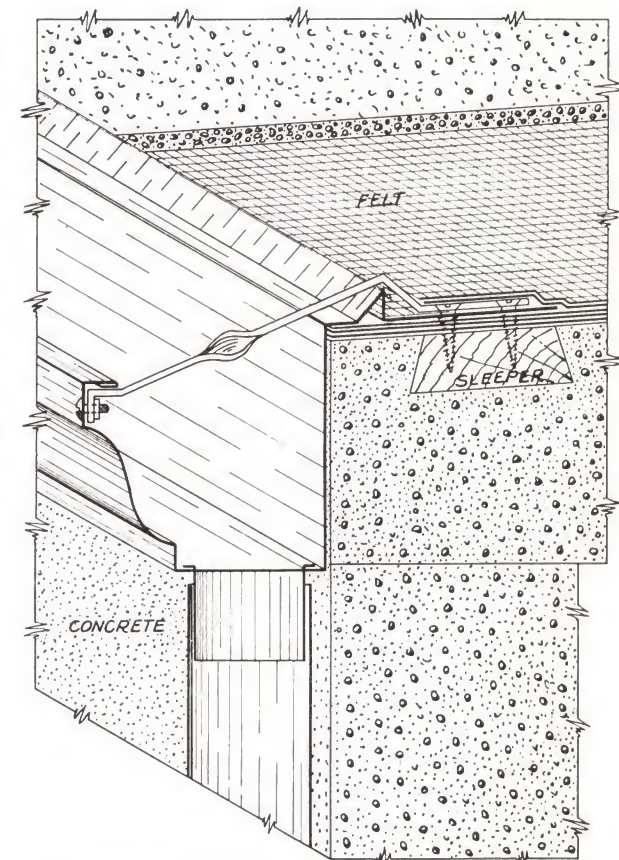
ANOTHER TYPE OF HANGING GUTTER WITHOUT
